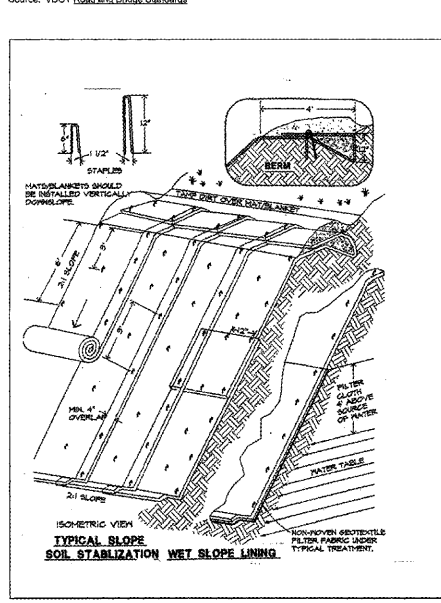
Erosion Blankets and Turf Reinforcement Mats - Slope Installation Source: Erosion Draw
